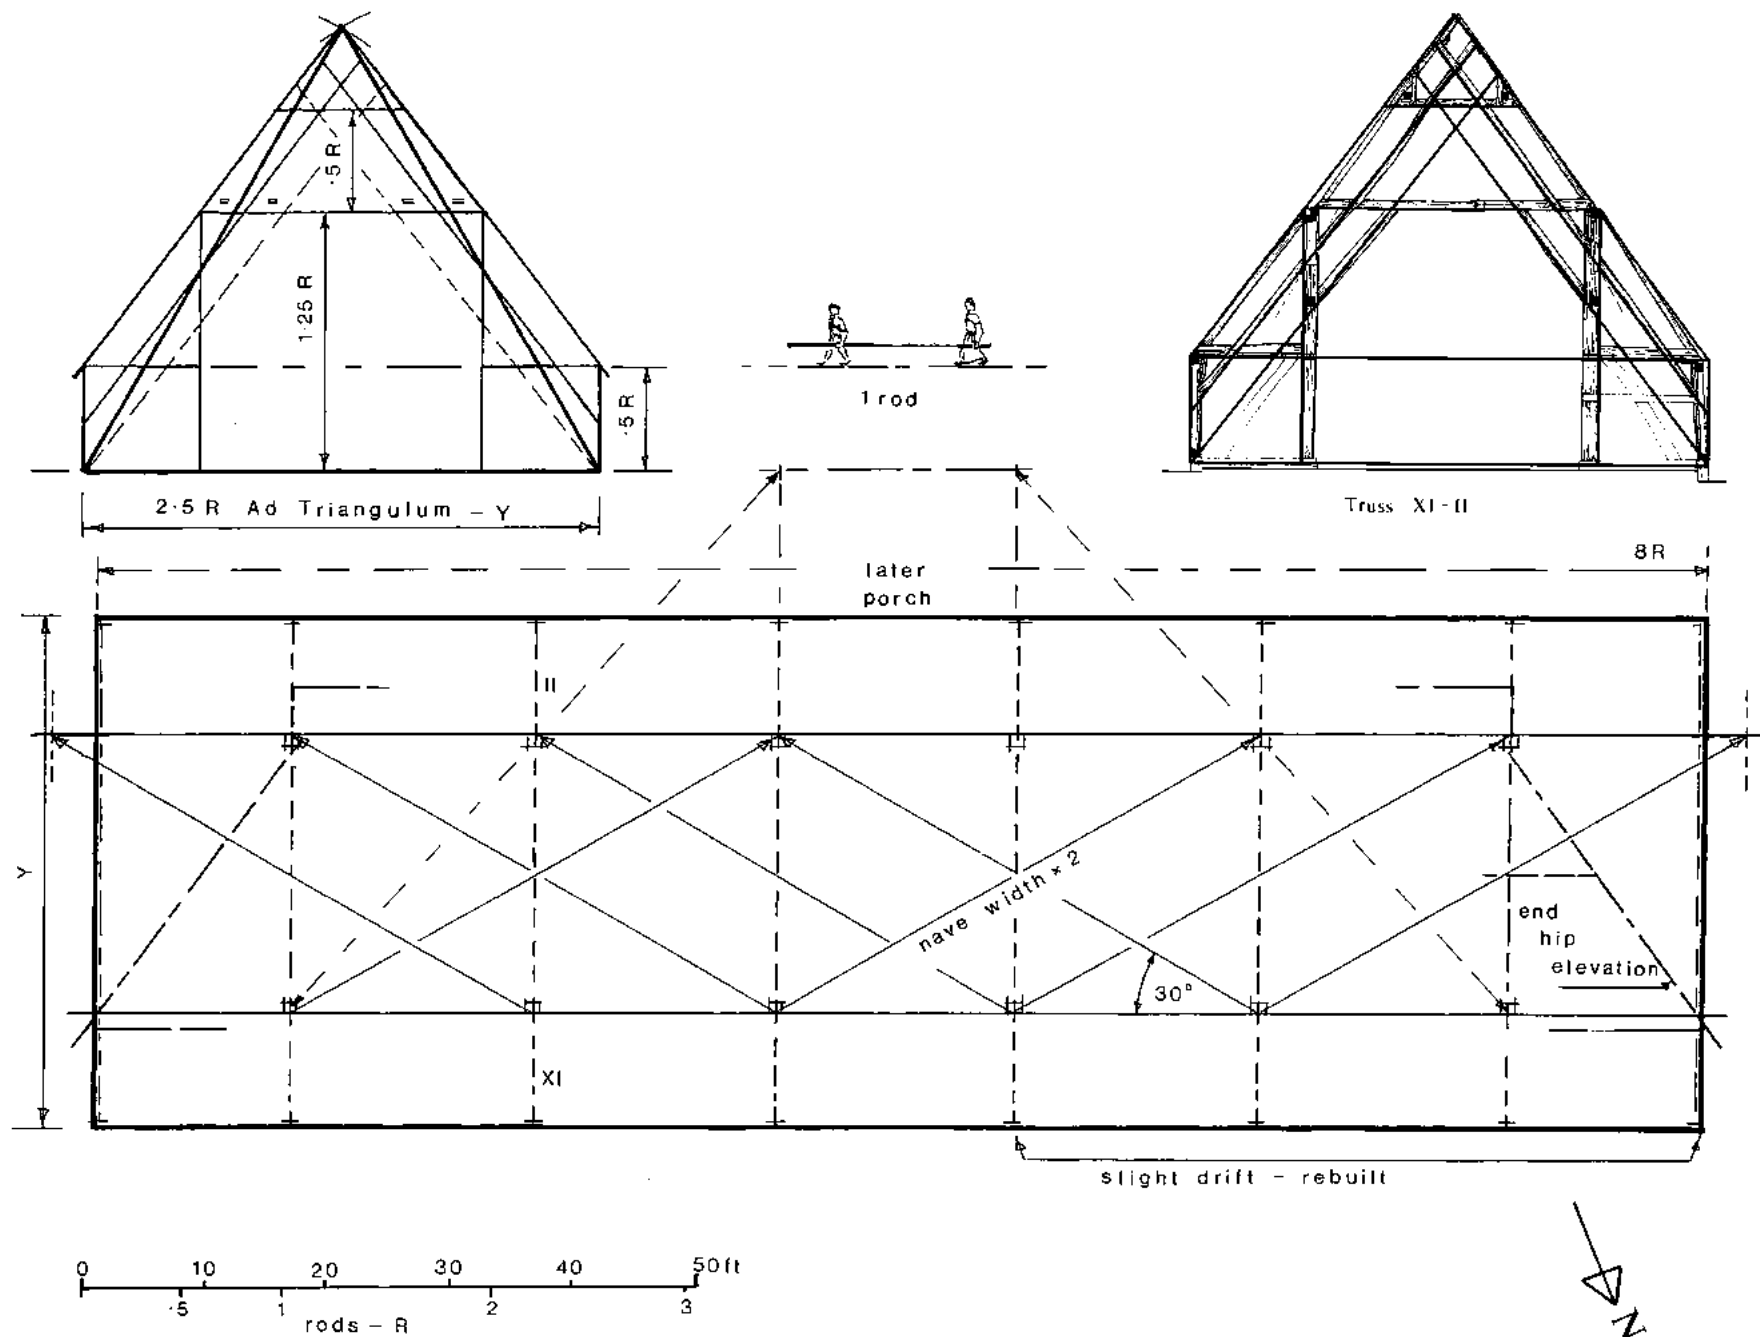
The geometry of the Wheat Barn (based on a survey by M. Wadhams, B. Crouch and author).
